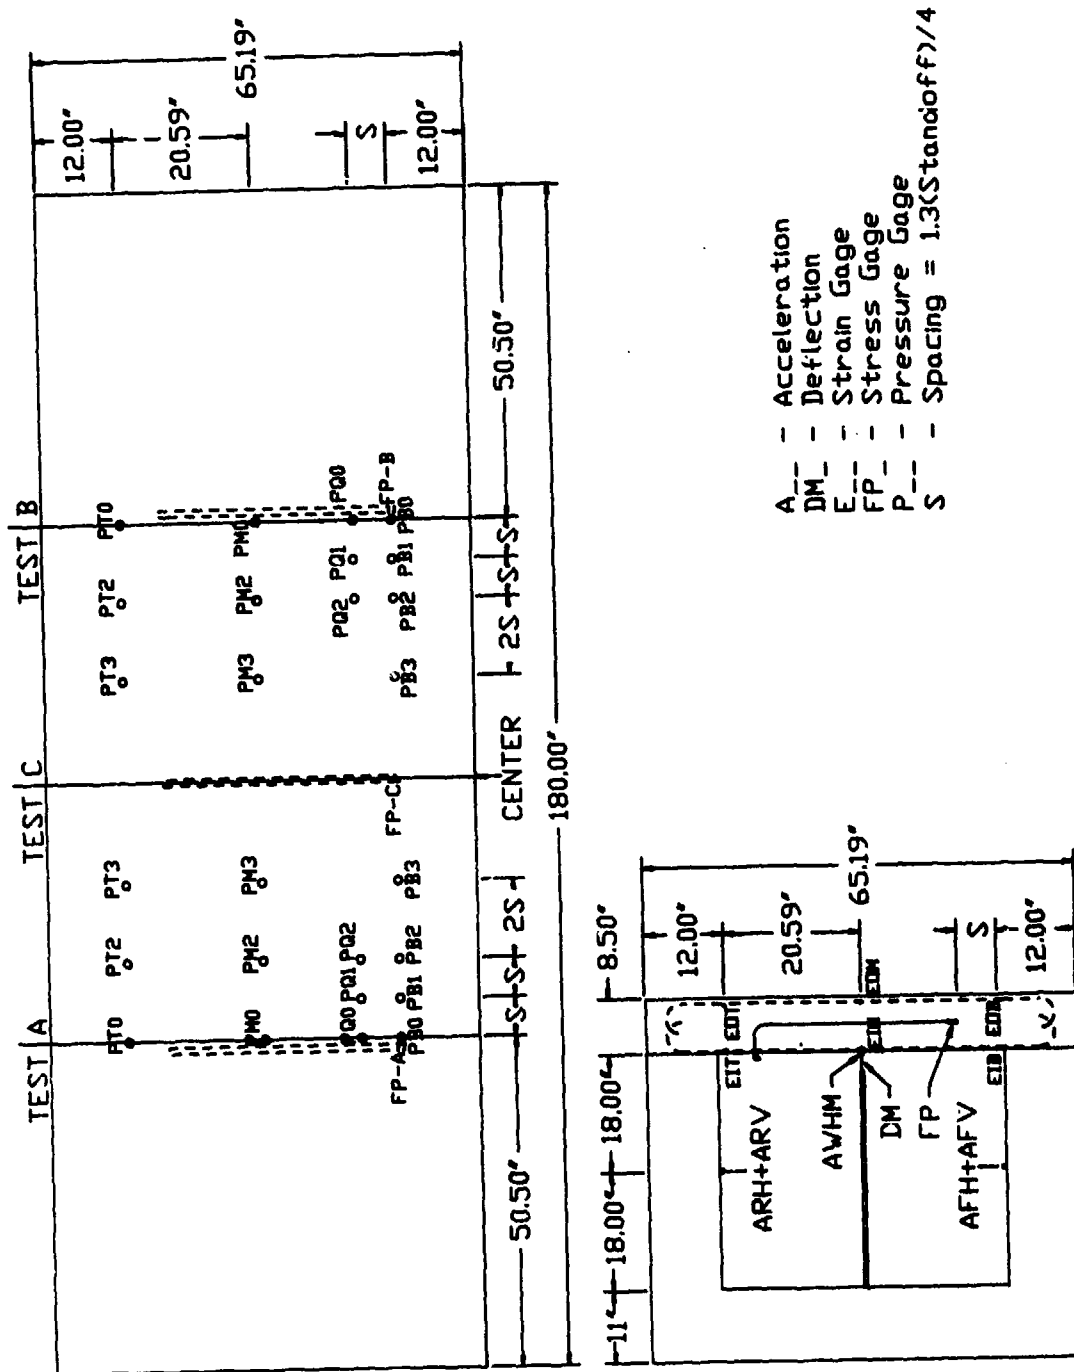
Typical layout of the active instrumentation in a wall panel and inside the reaction structure.
